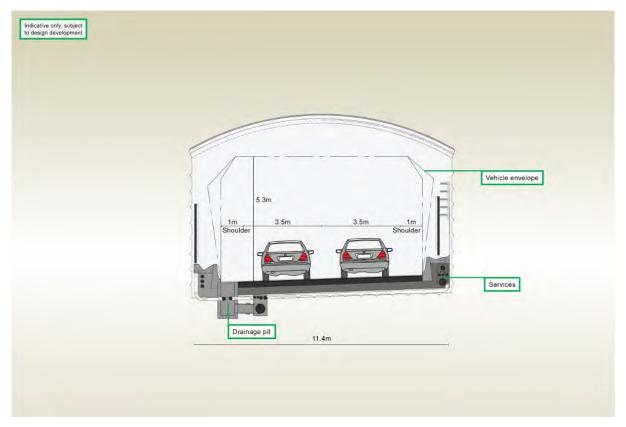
Indicative cross-section of the entry and exit ramp tunnels
